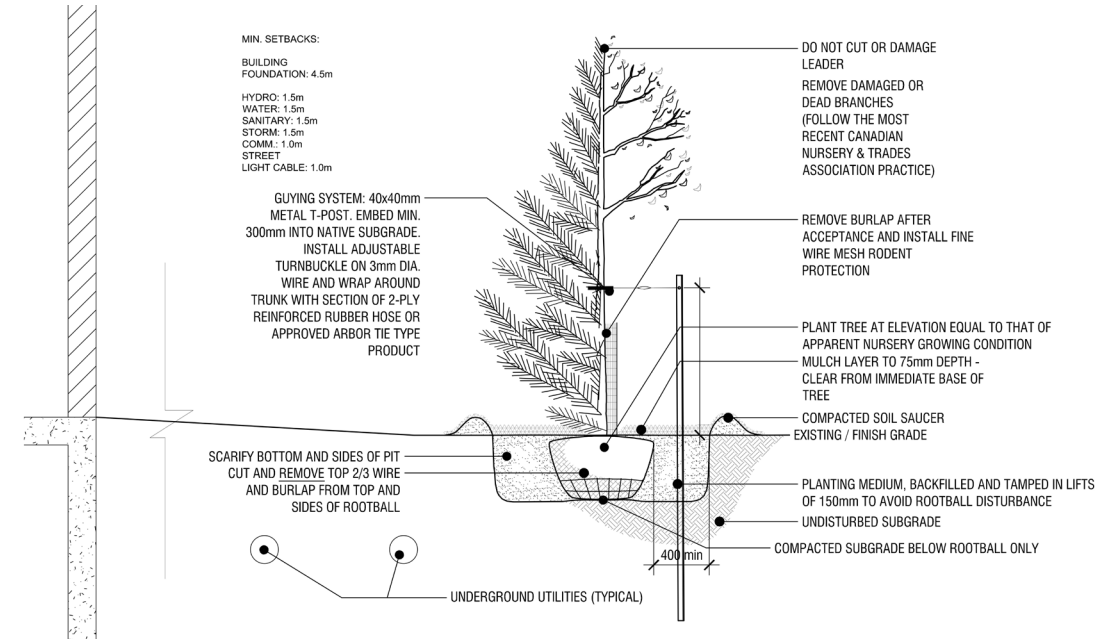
Tree planting detail. Please also note minimum distance from foundation noted above.
